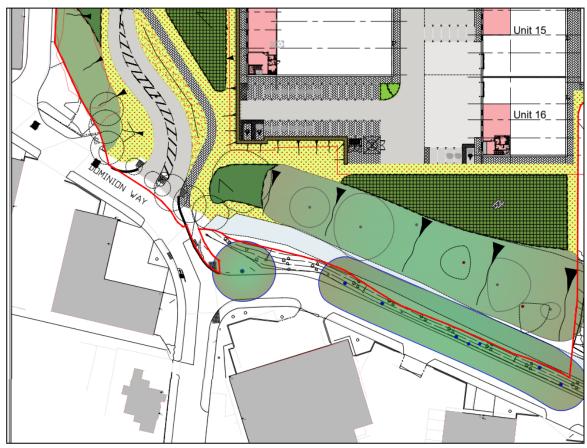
Fig III. Landscaped entrance to the proposed development, showing retained trees, new planting including woodland, and pedestrian entrance.
